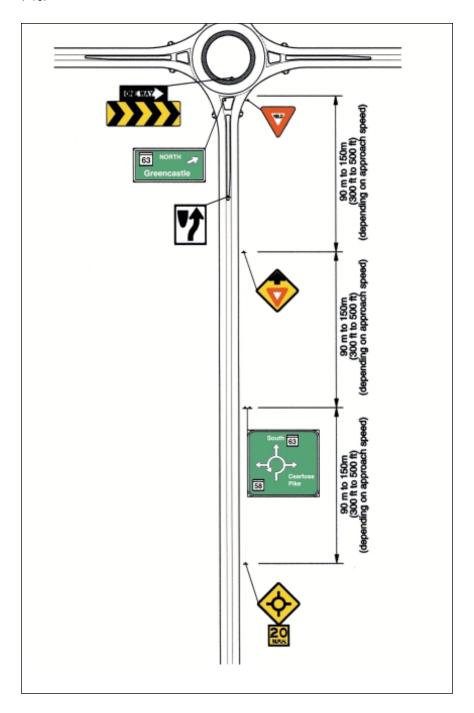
Sample signing plan for an urban roundabout.
